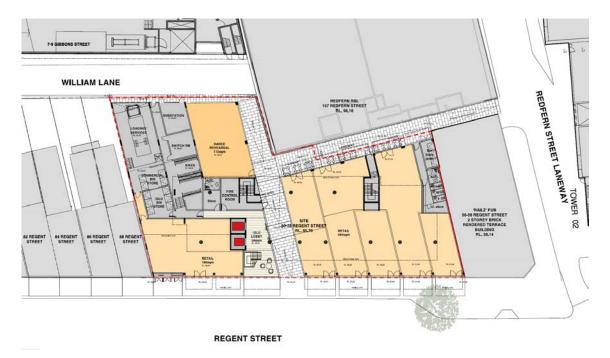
Proposed ground floor plan *Source: Bates Smart
